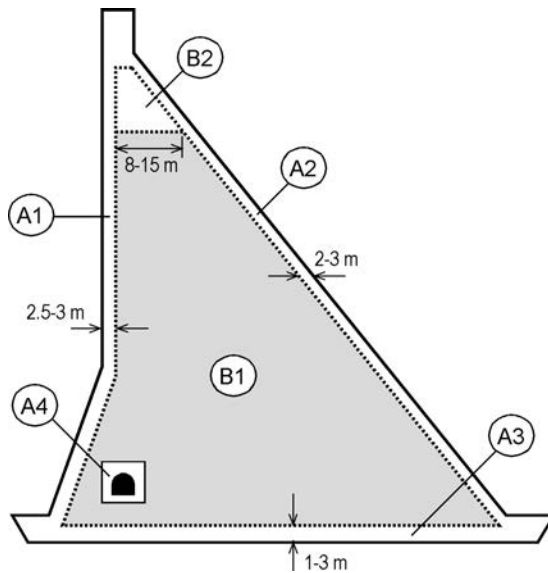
Cross-section of RCD dams with internal zoning (after Nagataki et al., 2008). (A1) Upstream external concrete zone; (A2) downstream external concrete; (A3) foundation concrete; (A4) structural concrete; (B1), (B2) internal RCD concrete zones.
